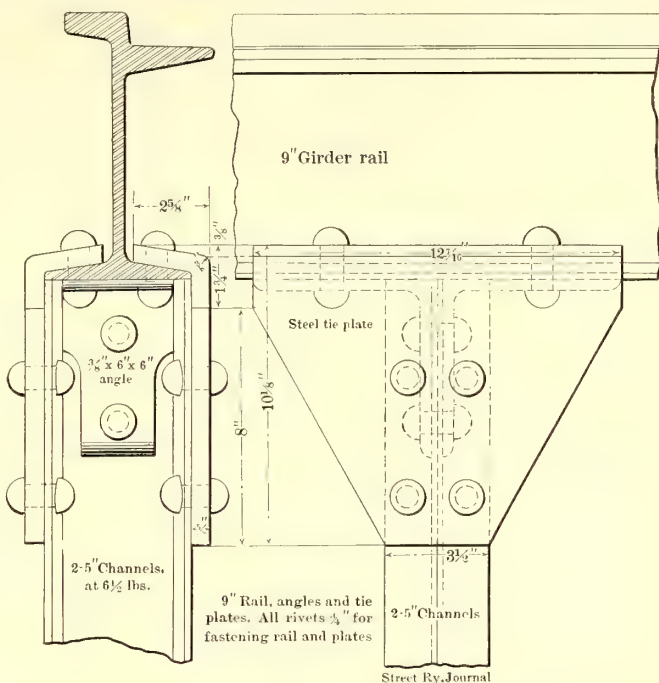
DETAIL SHOWING METHOD OF SUPPORTING RAIL ON COLUMNS IN PITS WITH DEPRESSED AISLES
